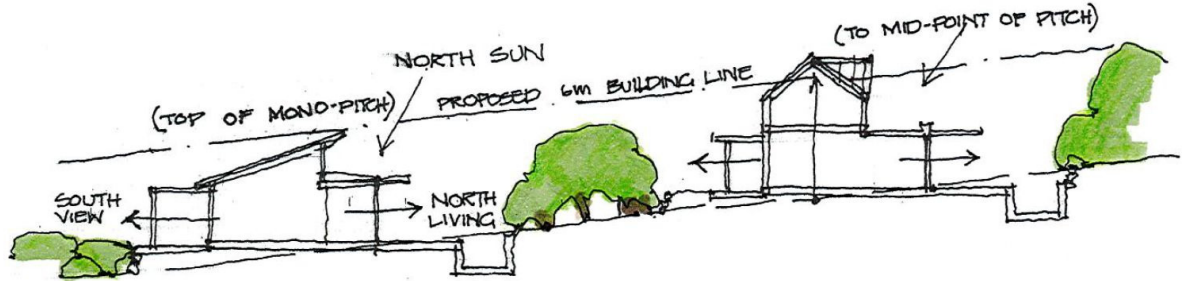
Typical cross section through single story & loft units indicating 6m height restriction
